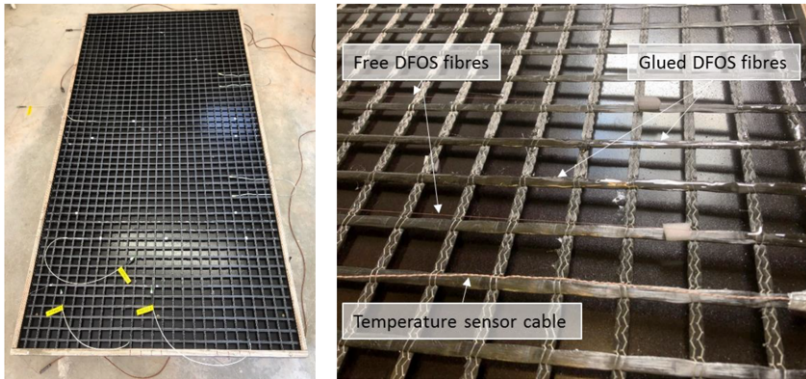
Formwork of the slab with installed reinforcement and measuring equipment
